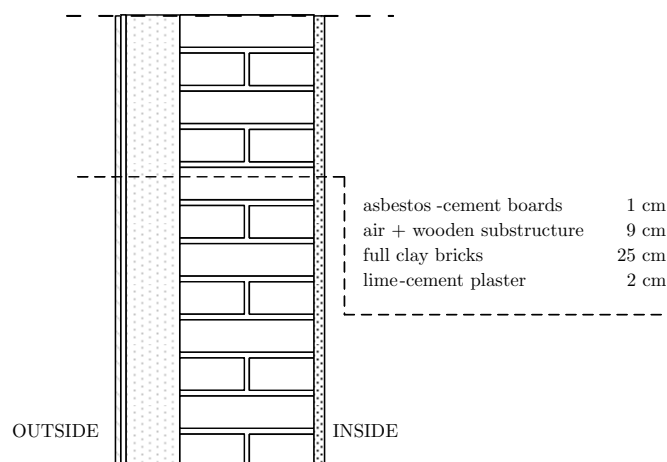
South- and north-facing external walls from ground-floor to 12th floor (EW3).
